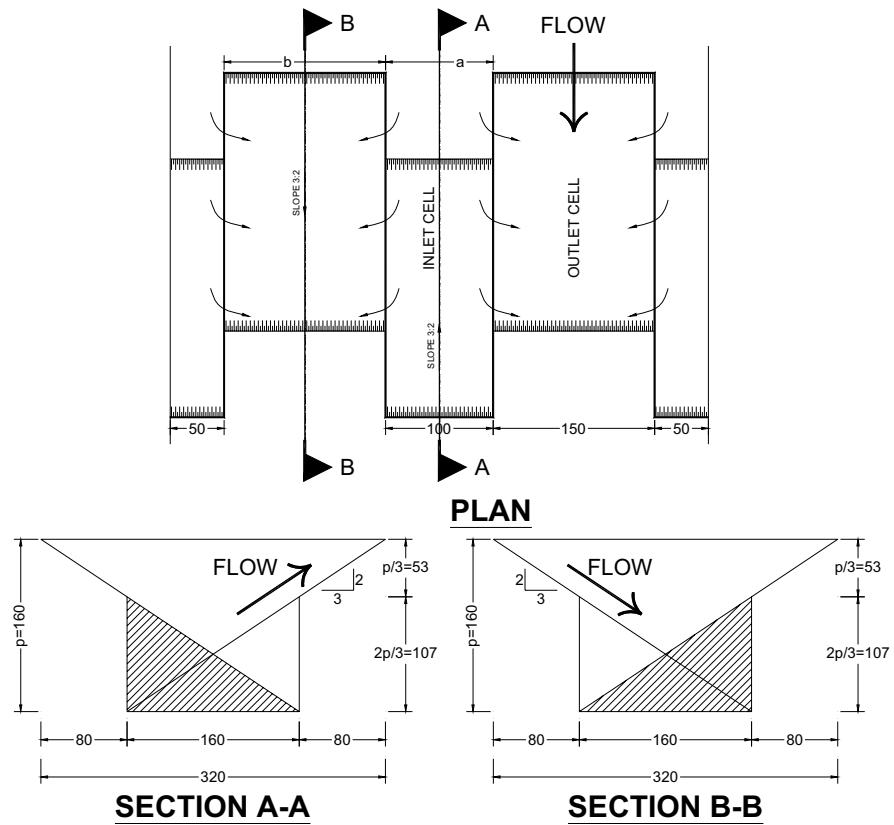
Plan and section of model P_3M_5 (both sides ramping), (dimensions in mm)
